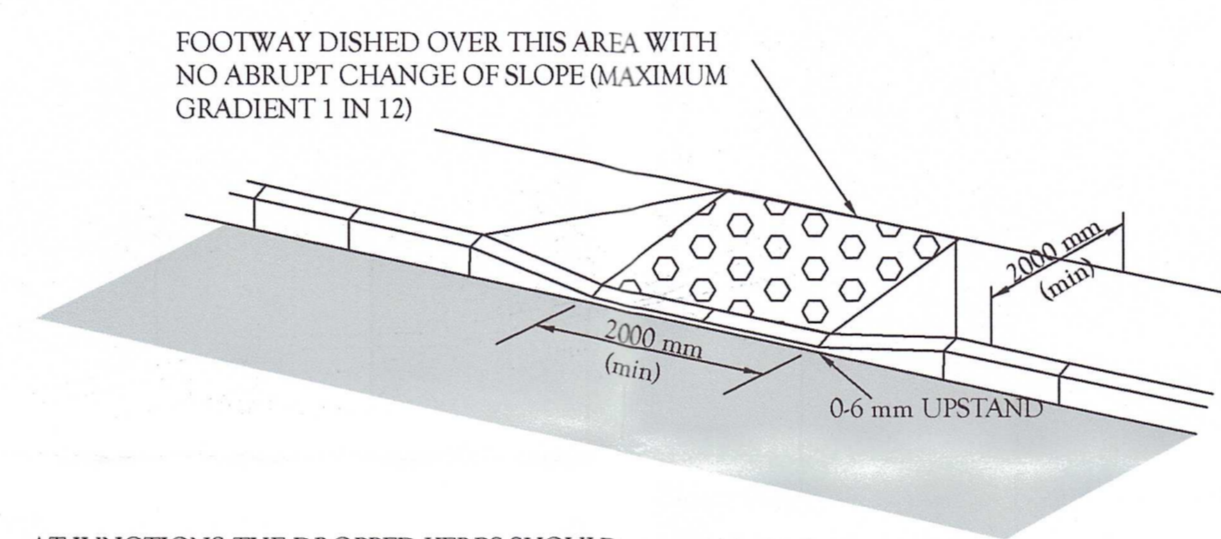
DETAILED CONSTRUCTION OF NEW ROAD & FOOTPATH
